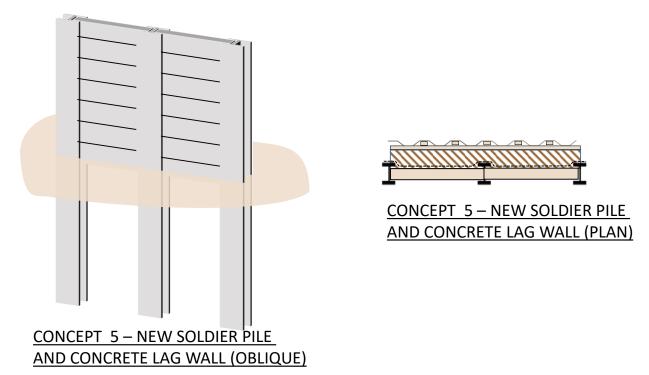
Concept 5 - New soldier pile wall and concrete lag wall section oblique and plan schematic.
